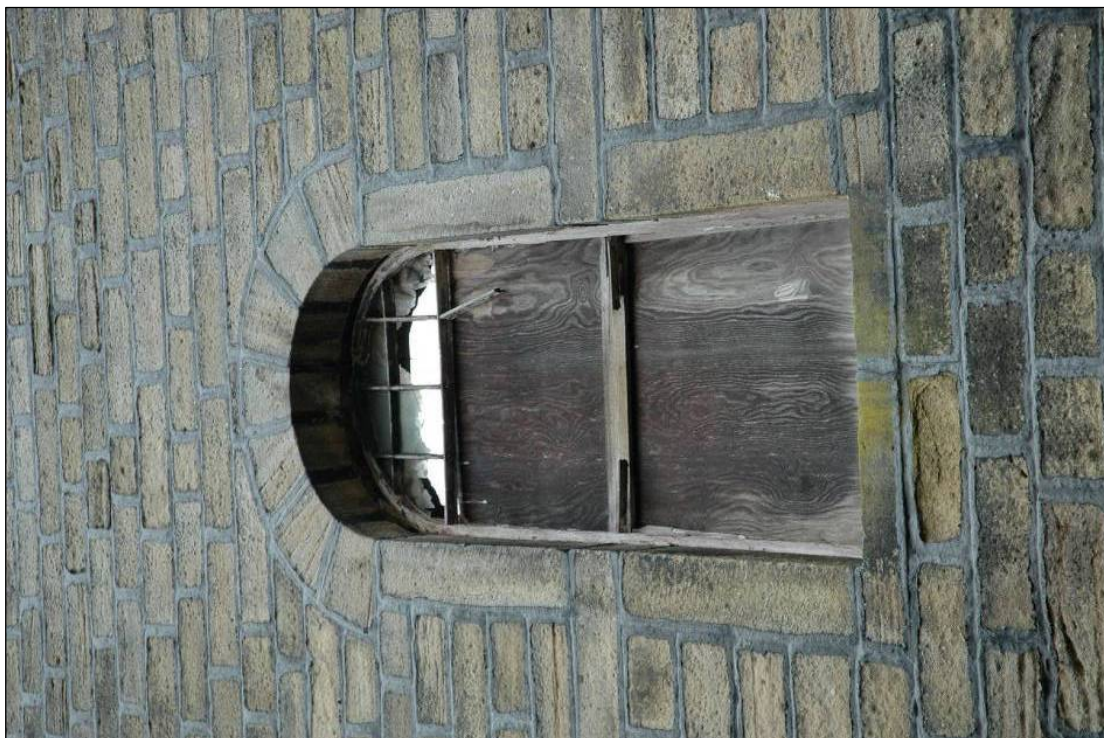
Arched window with wooden frame in south facing elevation of building 9 (2005)
